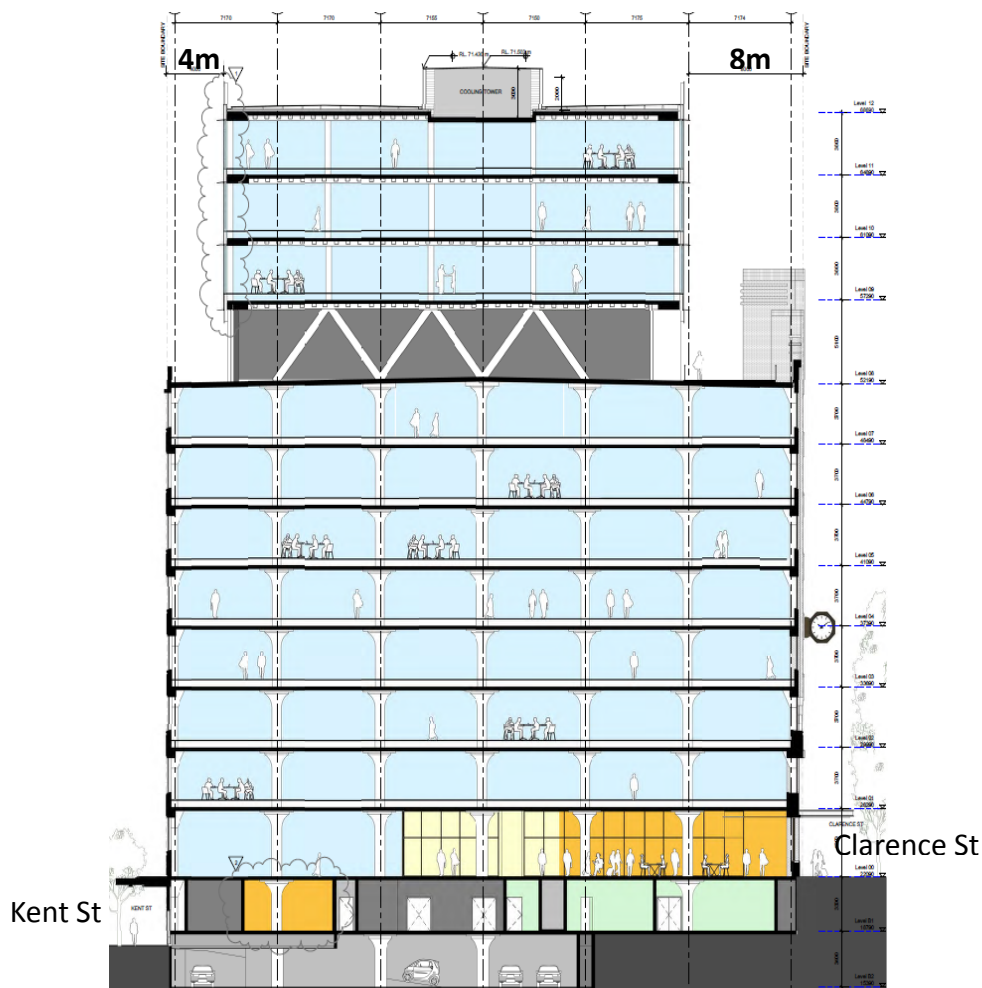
Cross Section (east-west) of approved Red Cross House development
